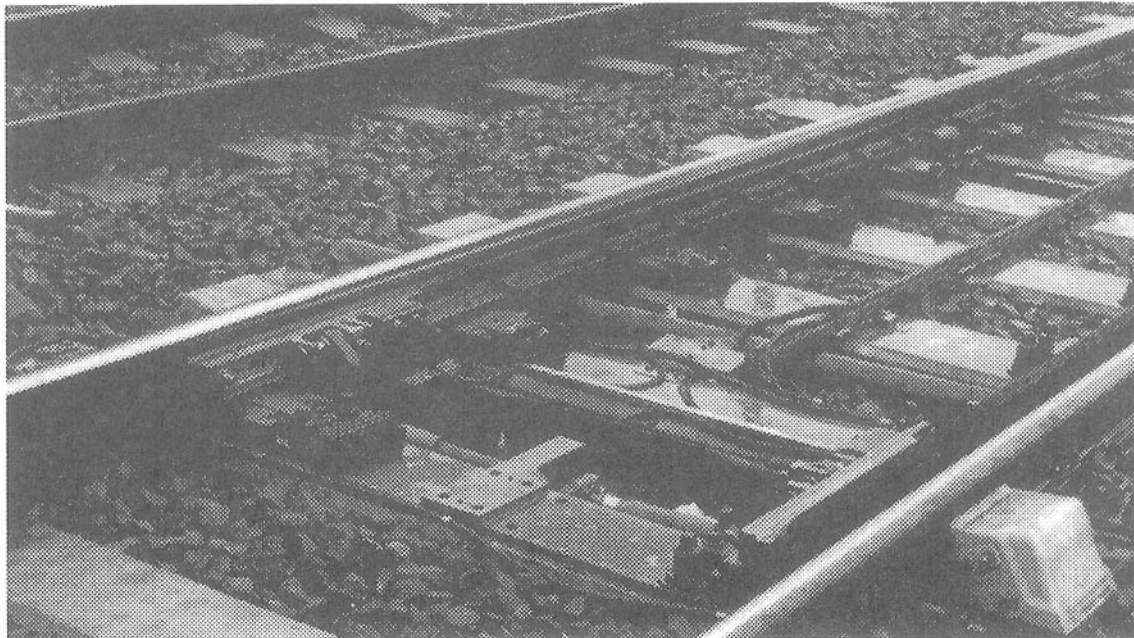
UIC asymmetrical switches on concrete bearers with electro-hydraulic clamp lock drive and facing point lock combined.
